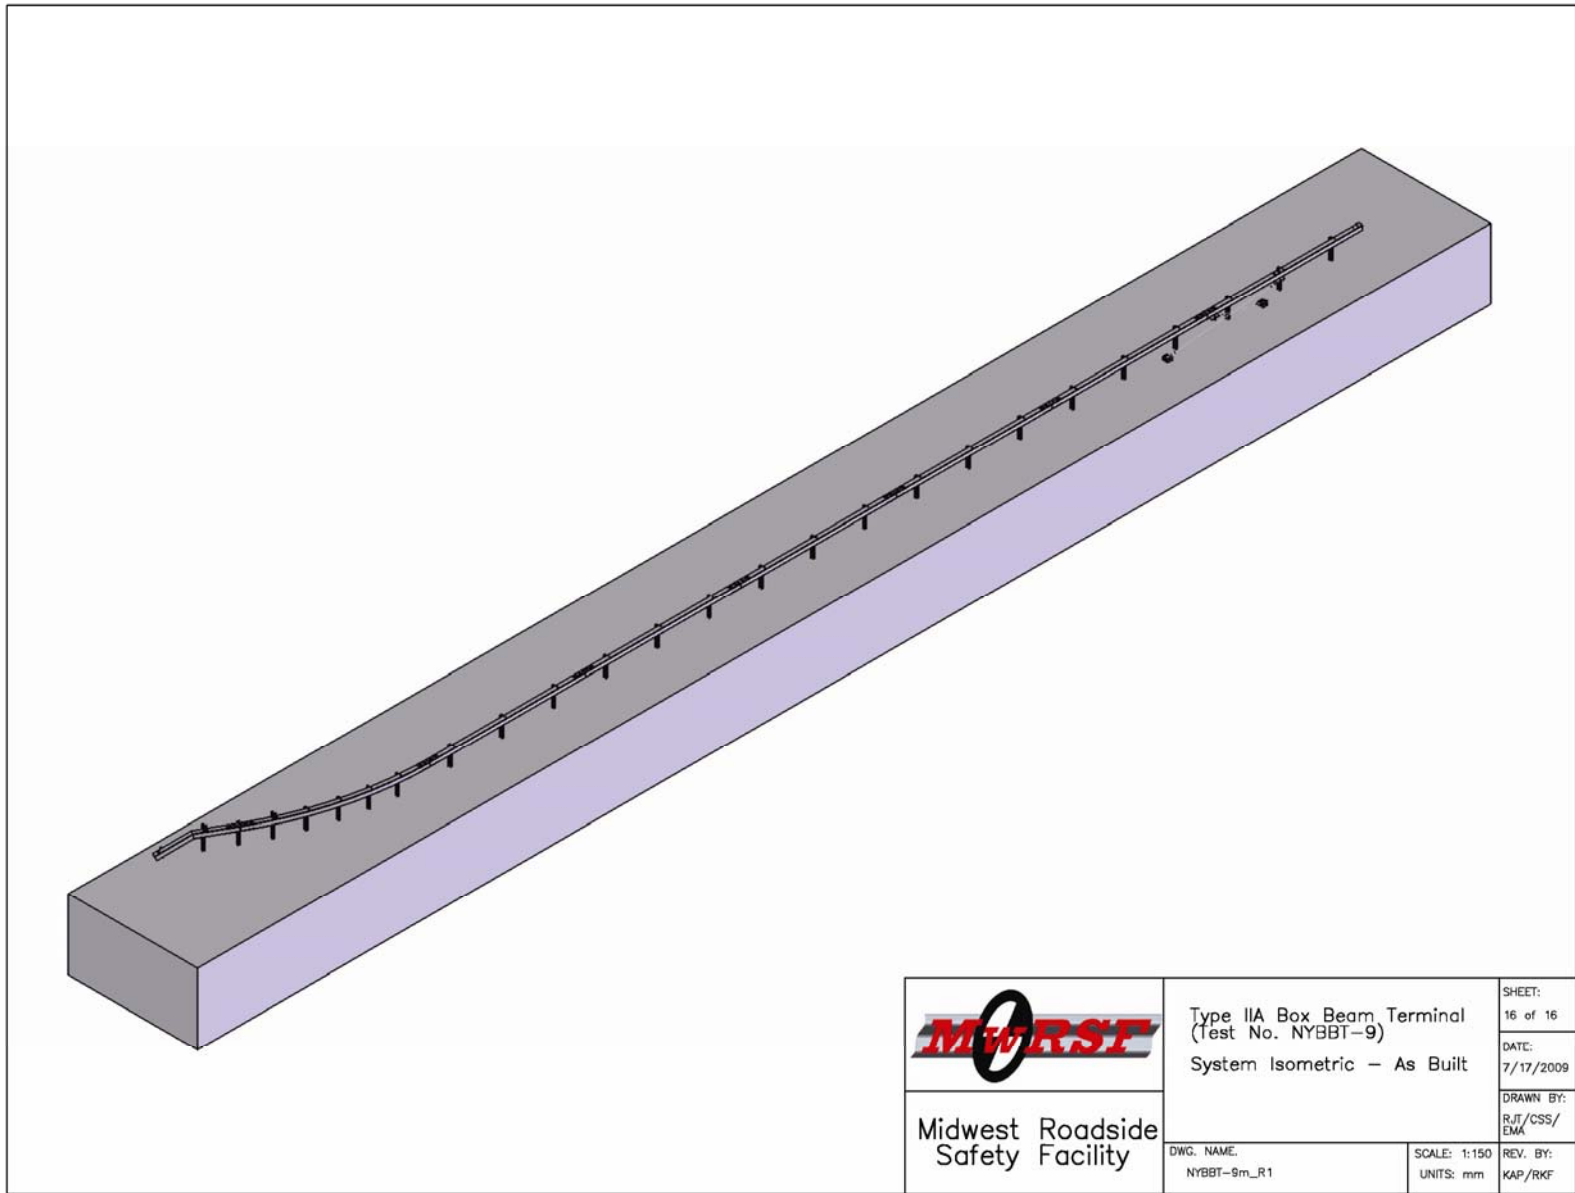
Modified Type IIA Box Beam Terminal System Details (Metric), Test No. NYBBT-9
